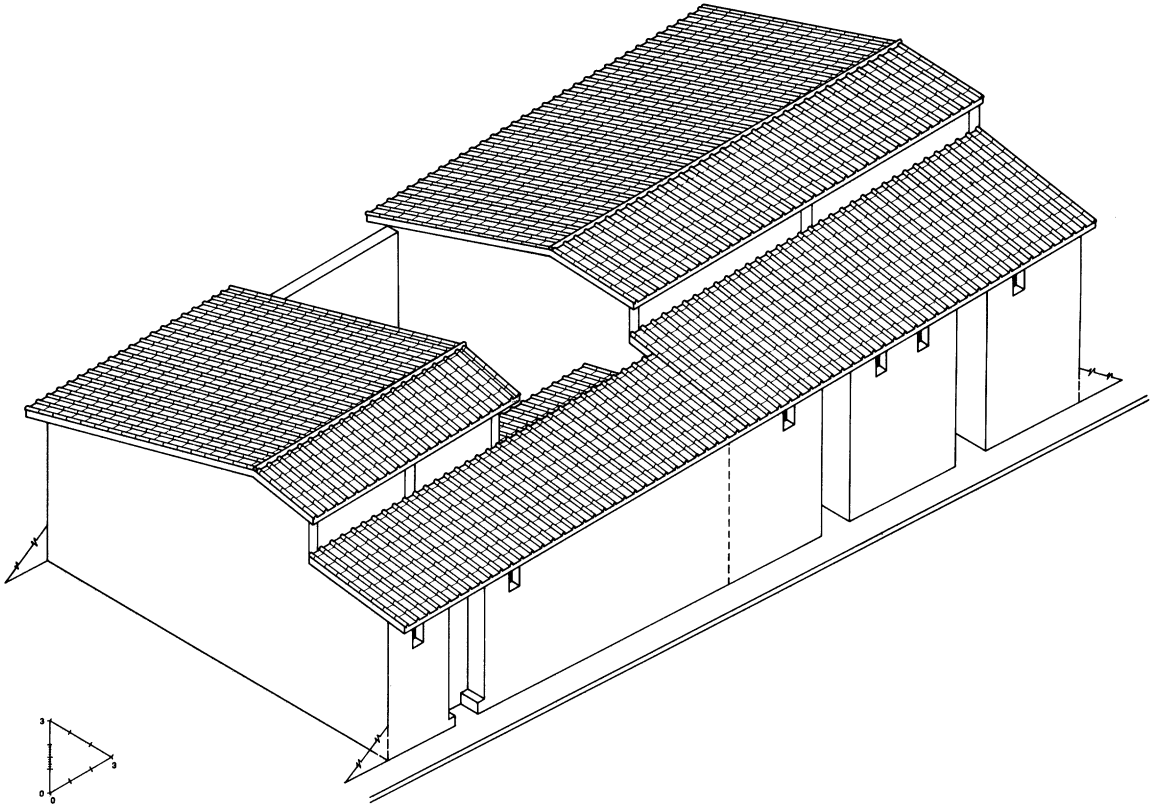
West Block, Period 1.3: House Lots 2-5, restored elevation
